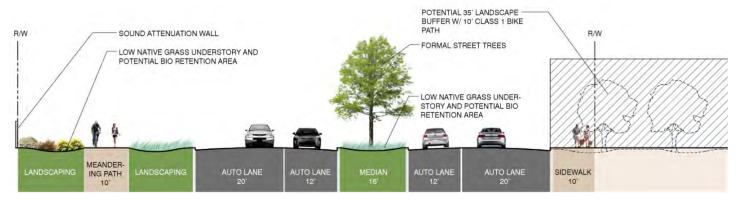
Vacaville: Leisure Town Road from Alamo Drive to Vanden Road
